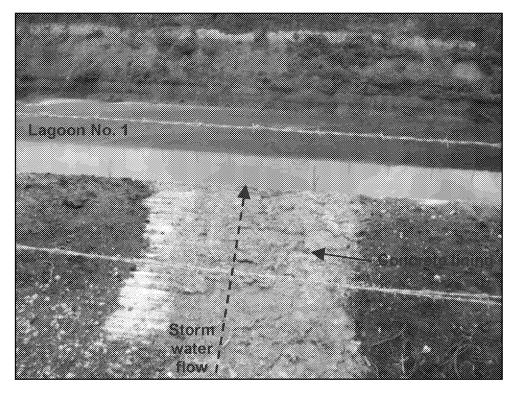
View facing west of the storm water flow pathway from the corrals into lagoon No. 1. Note all storm water runoff from the corrals enters the lagoon via sheet flow through the central cow lane.
